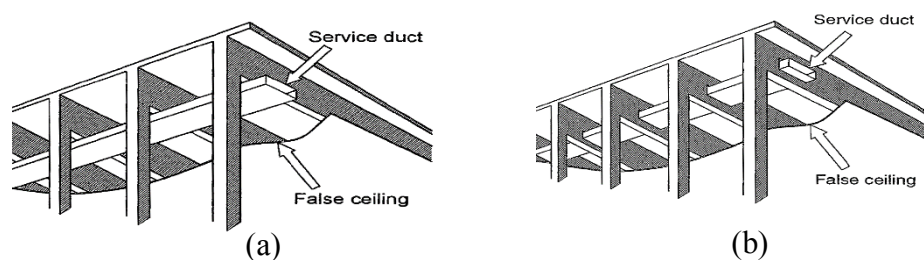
Typical Layout of Pipes for High Rise Building [2]
